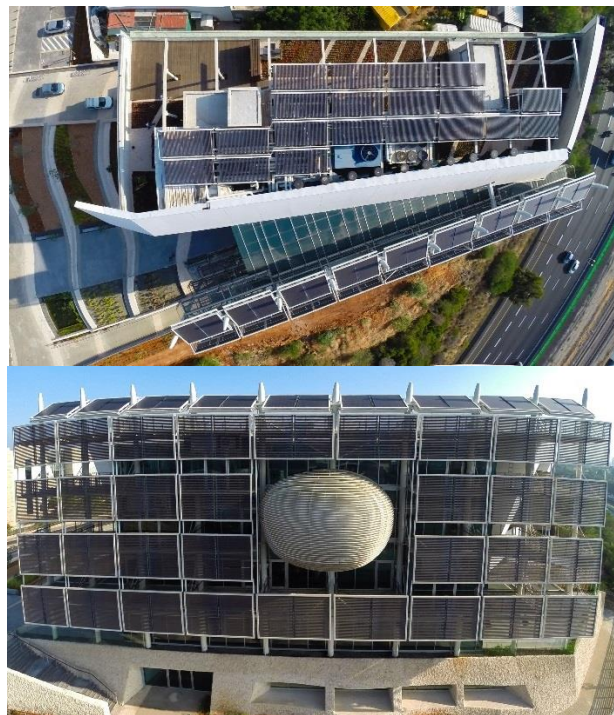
General view of the vacuum tubes installed on the building roof and façade.
